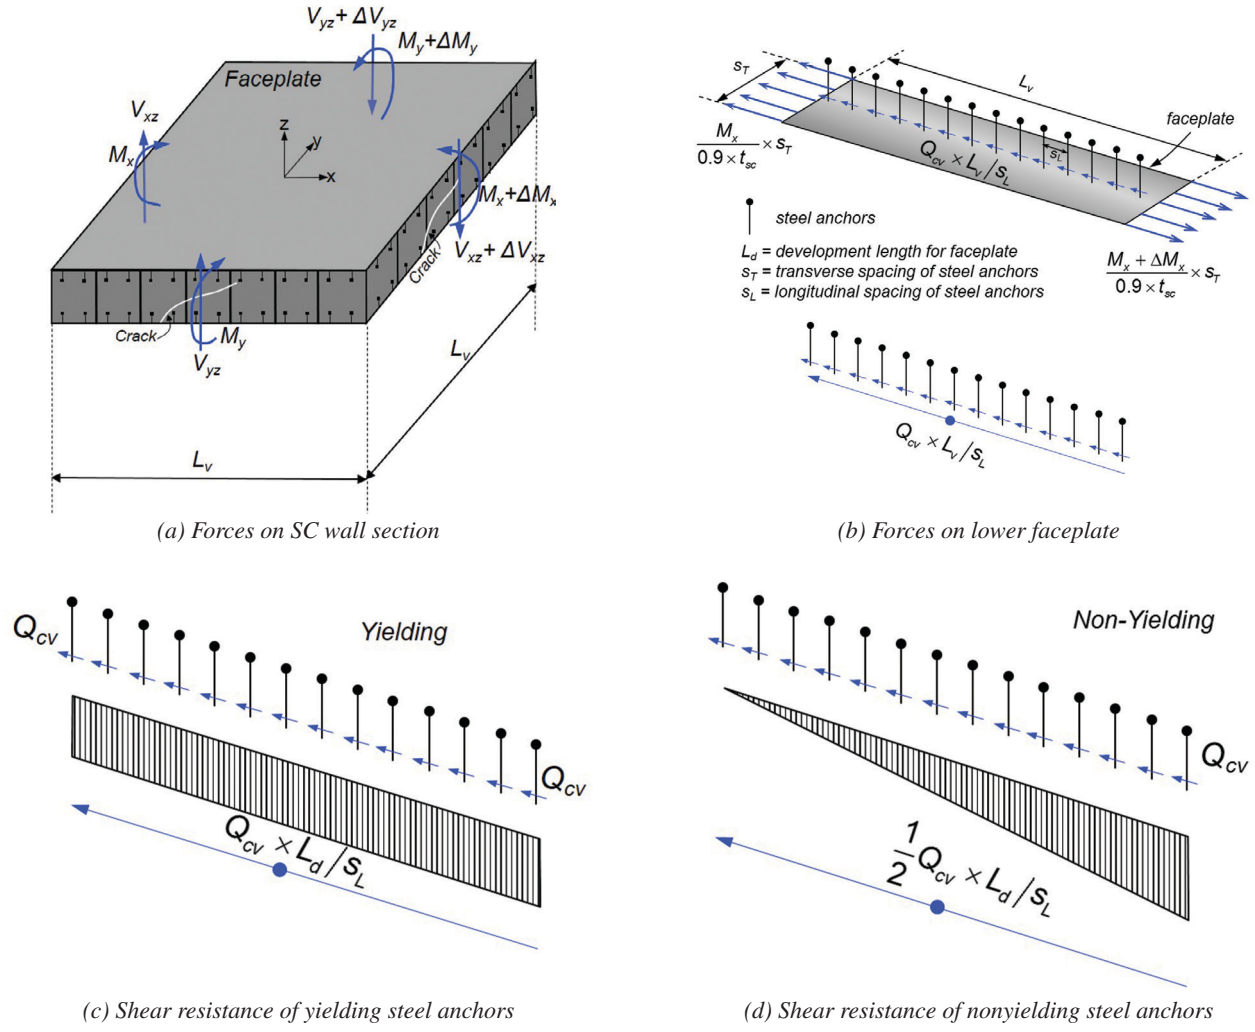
Steel anchor spacing requirement for preventing interfacial shear failure before out-of-plane shear failure.
